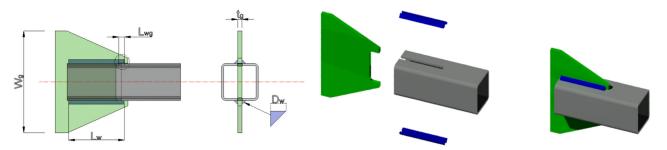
Details of SHG HSS brace connection and assembly of parts.
